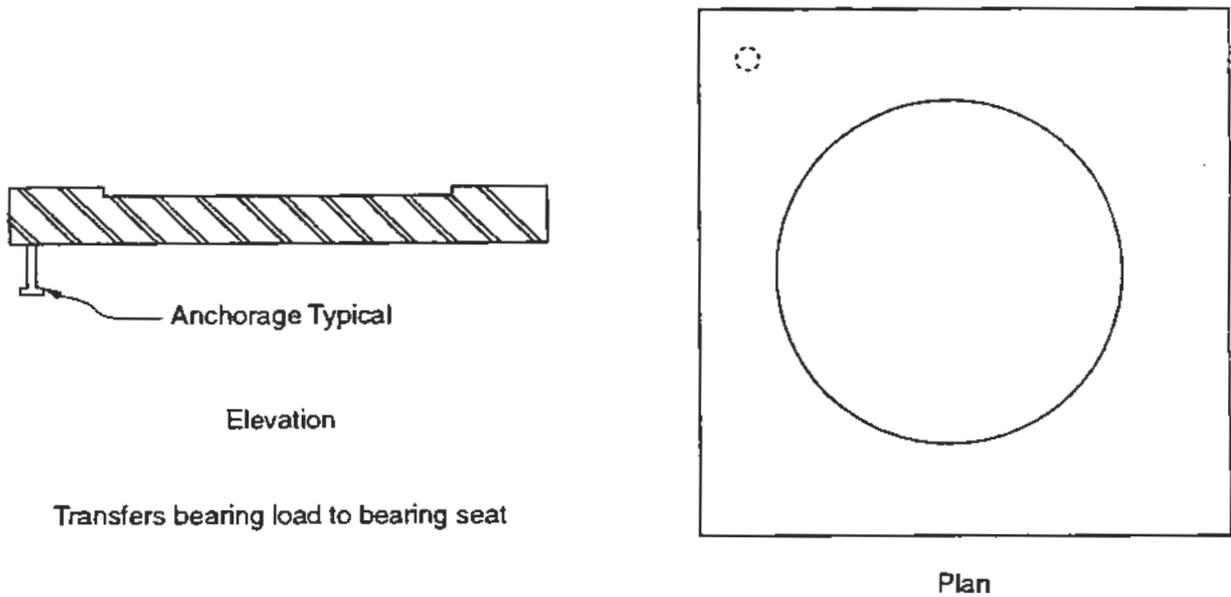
PTFE/Spherical Expansion Bearing Components
